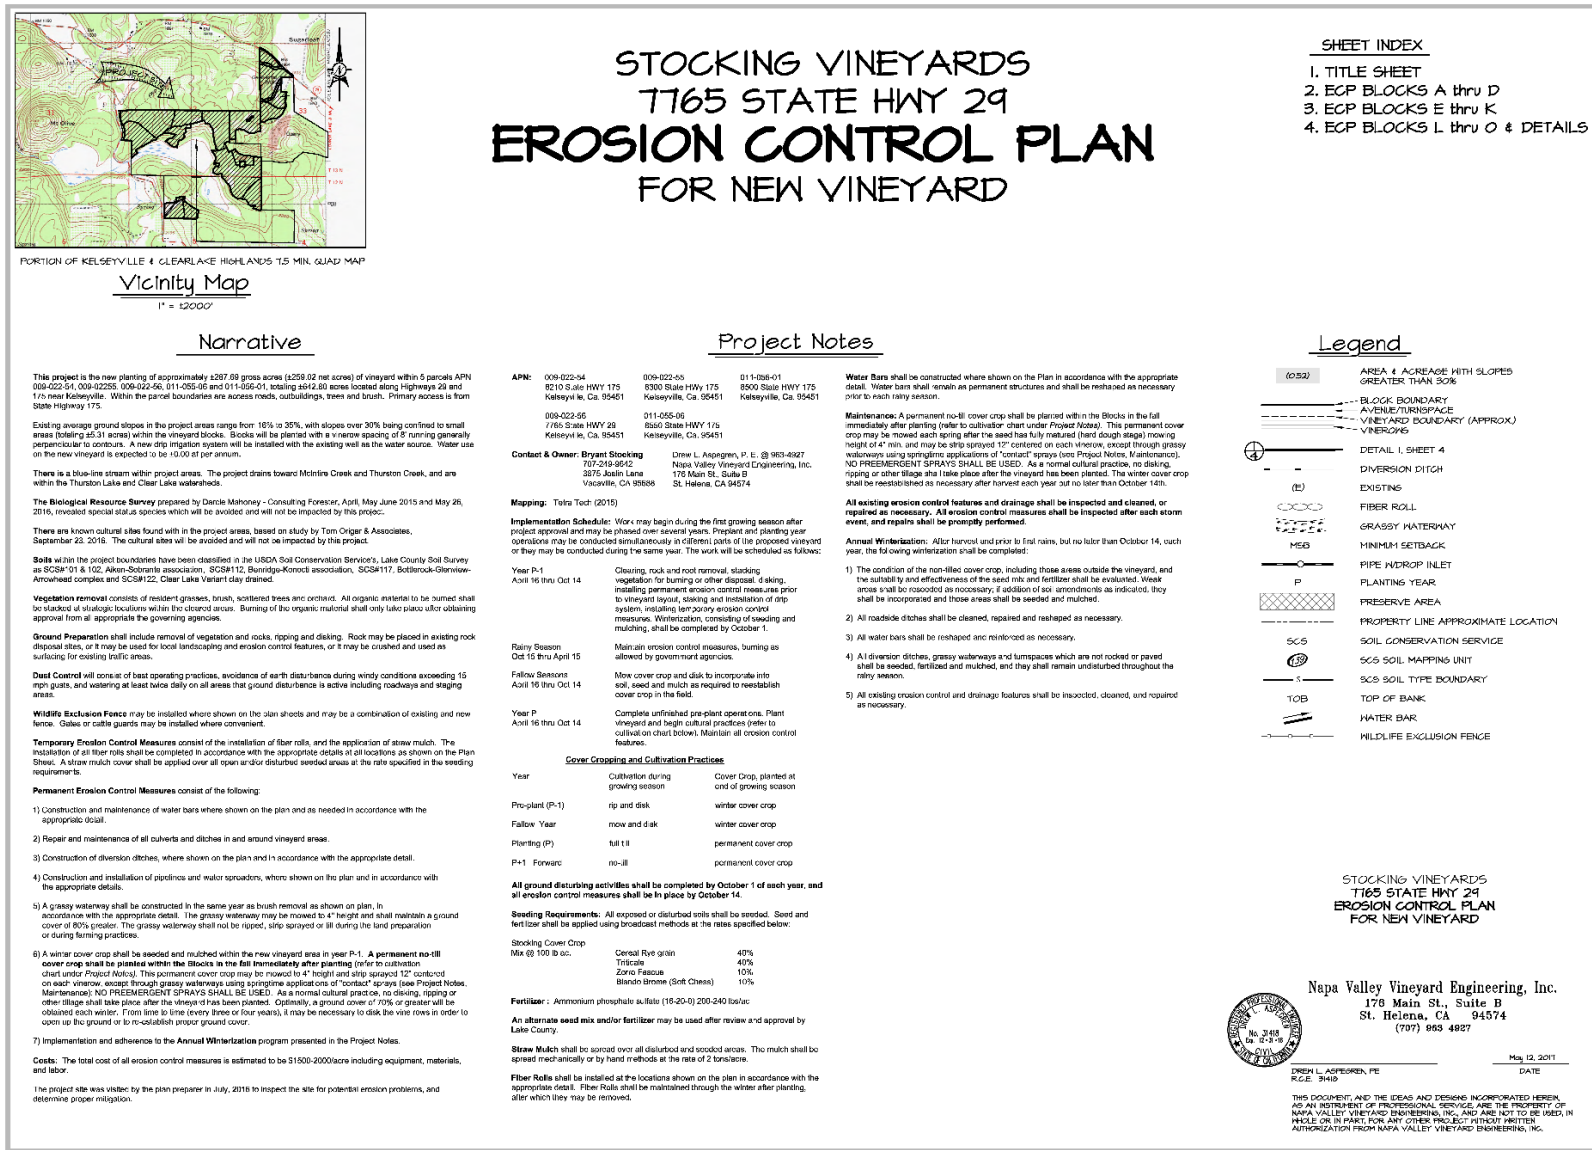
Stocking Vineyards Erosion Control Plan Page 3
